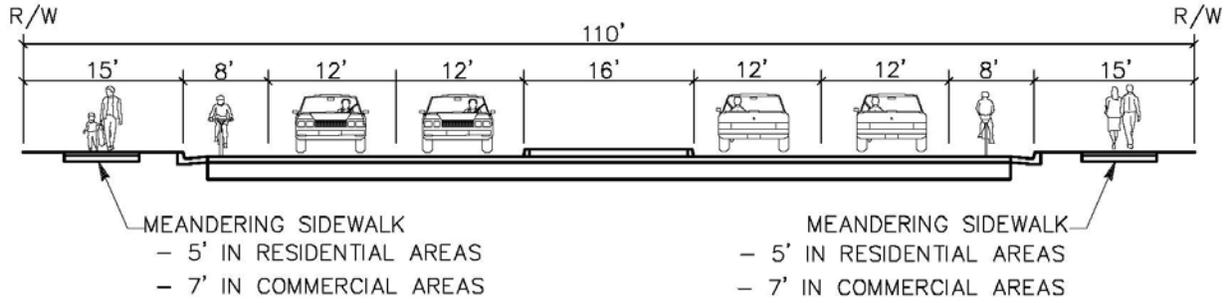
Segment 2 and 3 – Ultimate Roadway Section with Bicycle Lanes (Looking East)
